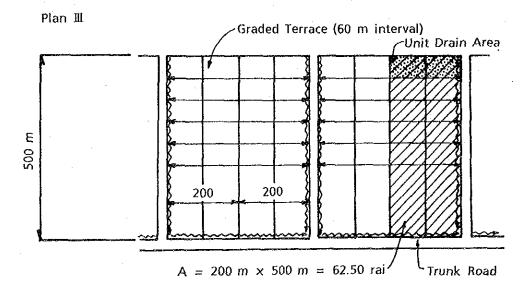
Farm Road, Drainage and Terrace Arrangement
